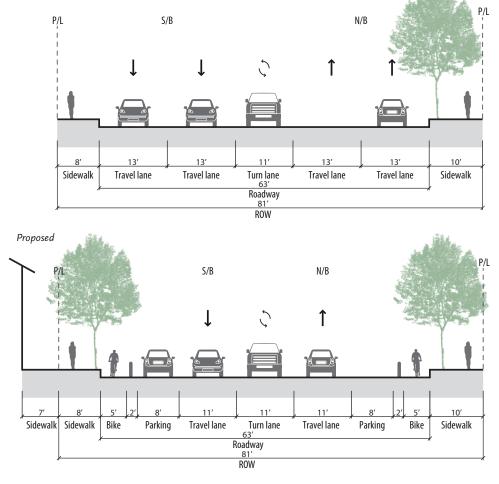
Typical Cross-Section for Glendora Avenue, Ada Avenue to Route 66.
